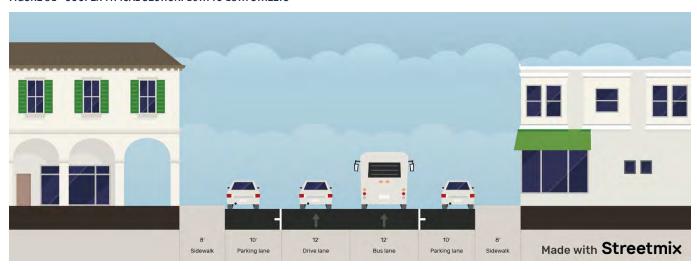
COLORADO TYPICAL SECTION: 10TH TO 13TH STREETS
